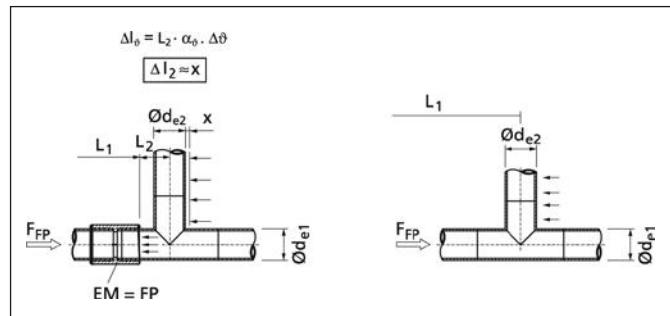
Shear and fixed point forces on tees and 45° branches
